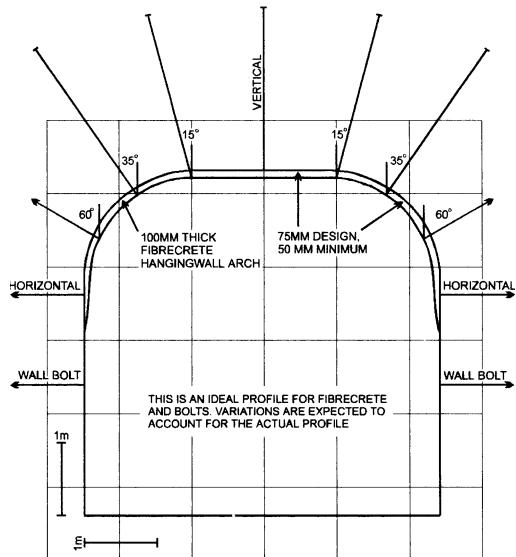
Sprayed fibrecrete and bolting at Site 3. W-straps installed at development stage.
